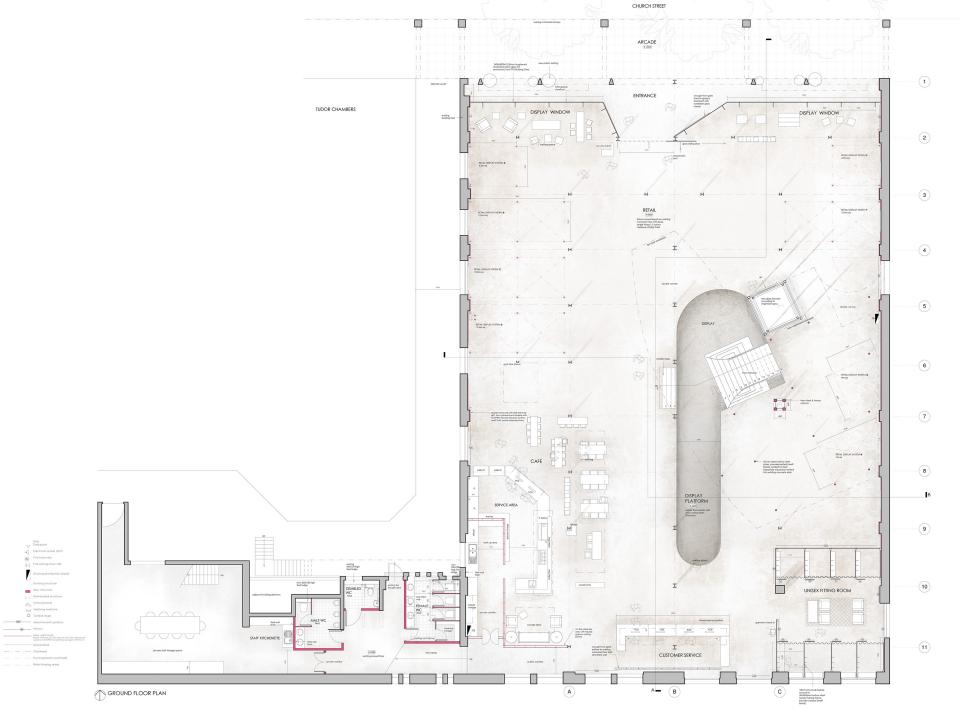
Ground floor plan-not to scale (Author 2013)
